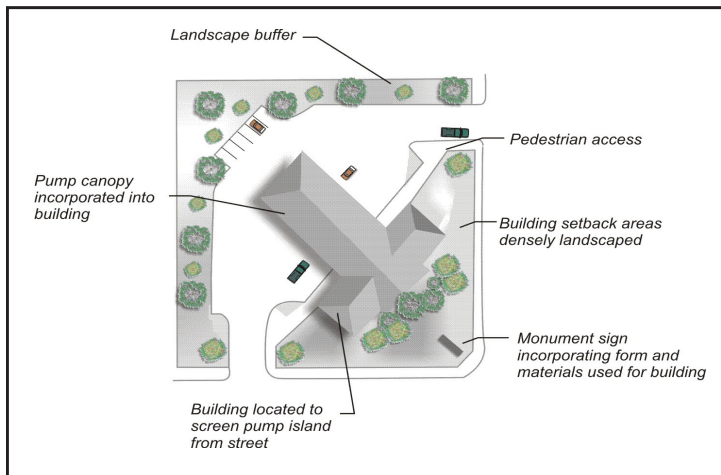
Service station bays should be screened from view by building placement and landscaping
